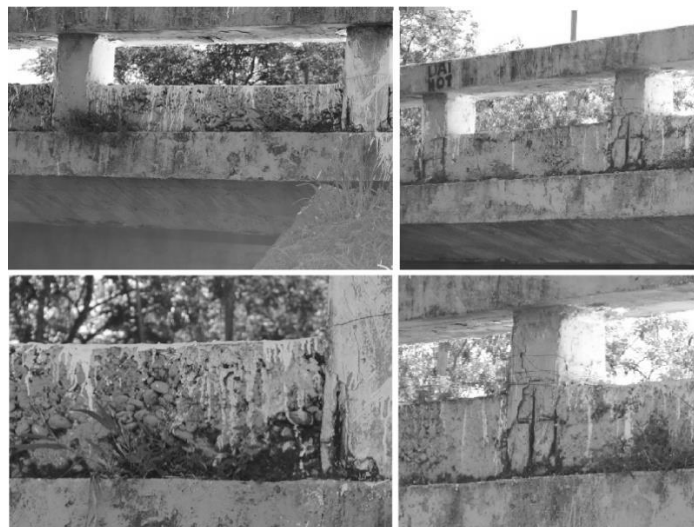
Failure in concreting, displacement of concrete, and pathological manifestations on the rebars (Bodyguard)
